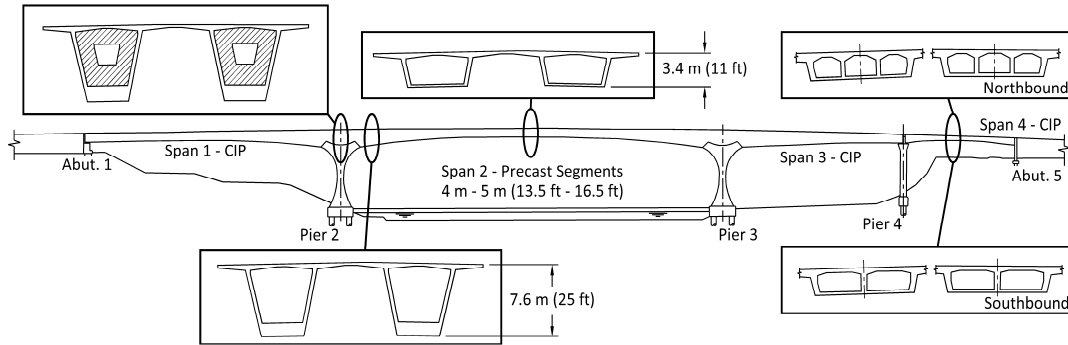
Elevation view of St. Anthony Falls Bridge (Hedegaard et al. 2013, © ASCE)
